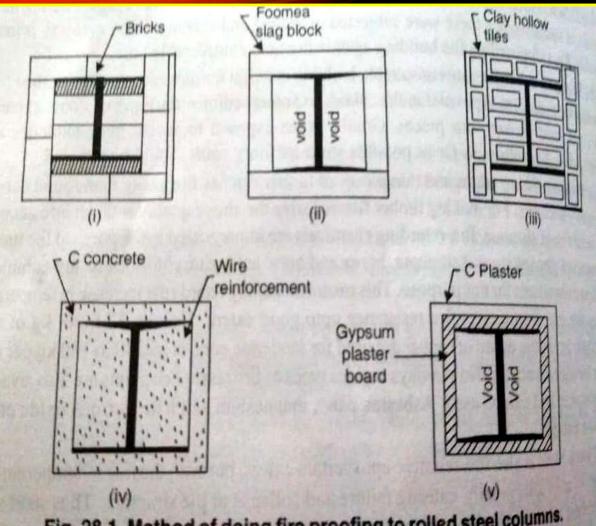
Method of doing fire proofing to rolled steel columns.
